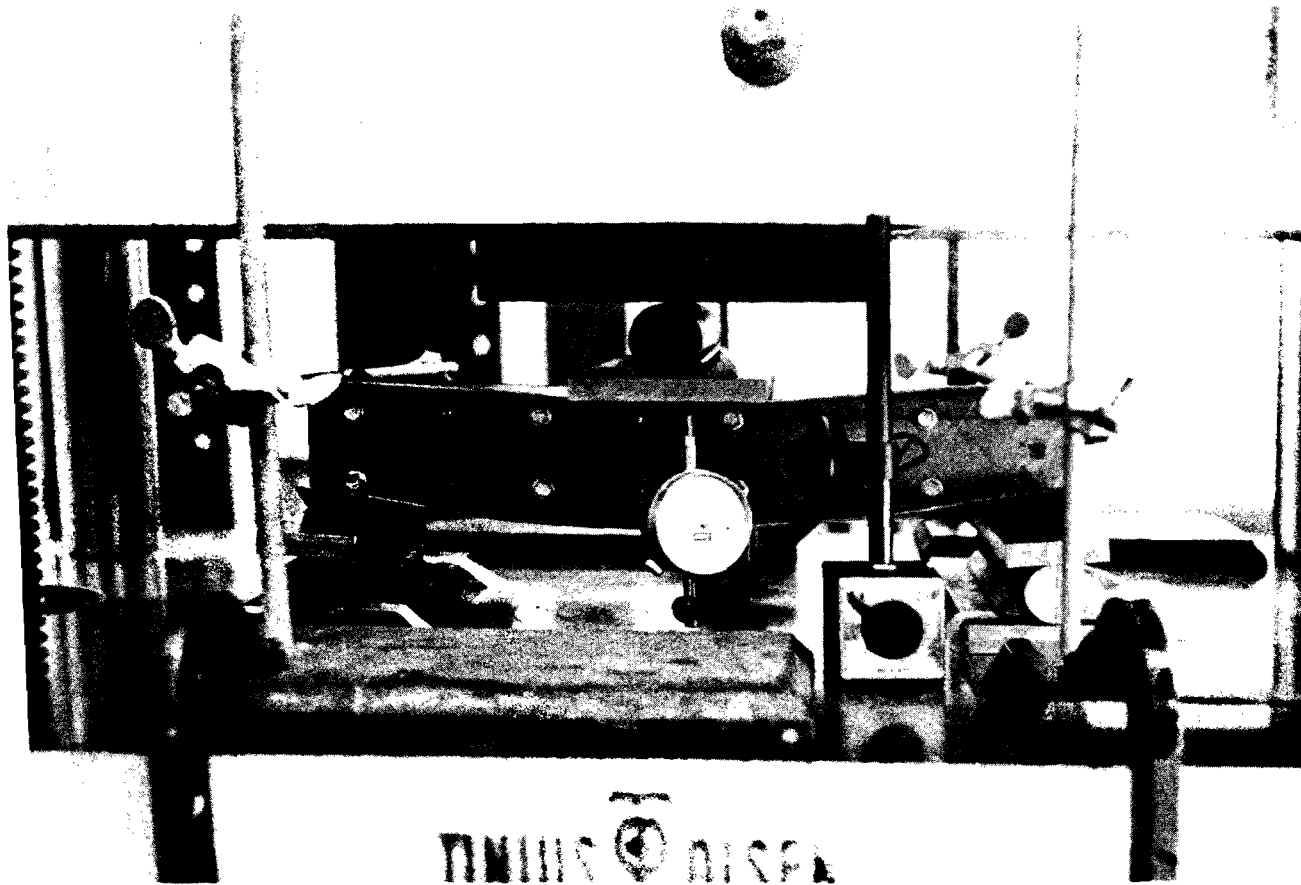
Photograph Showing I-beams Subjected to End One-Flange Loading at Failure
